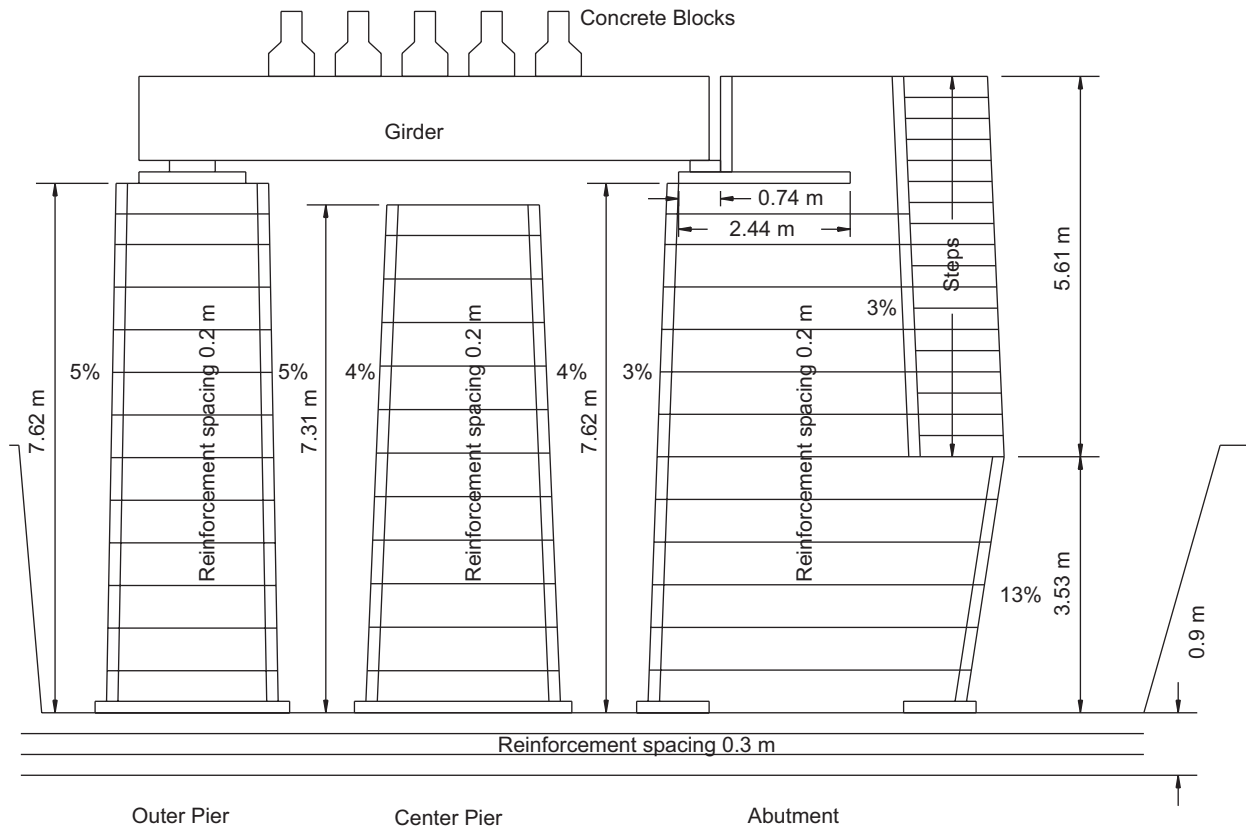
Cross-section of the Havana Yard GRS bridge pier and abutment, Denver, Colorado, (Ketchart and Wu, 1997).
